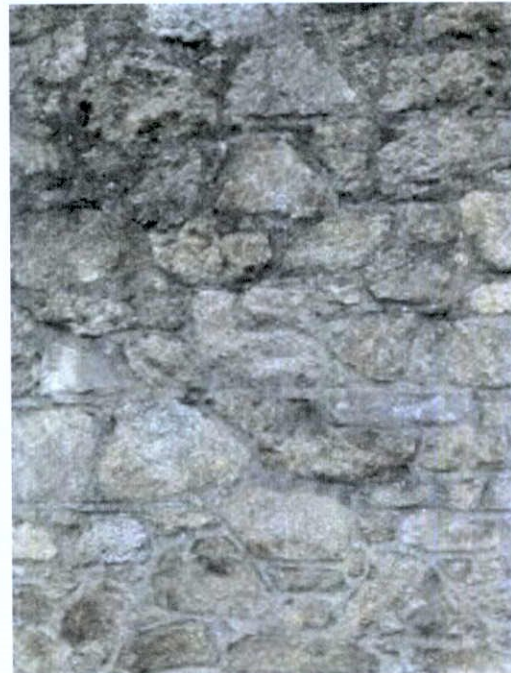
Composition of boundary wall varies, sections of rubble wall have been infilled
